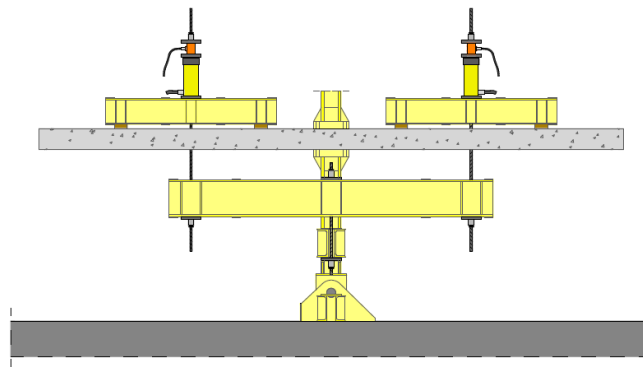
Vertical load application system, adapted from Almeida et al. [1].
